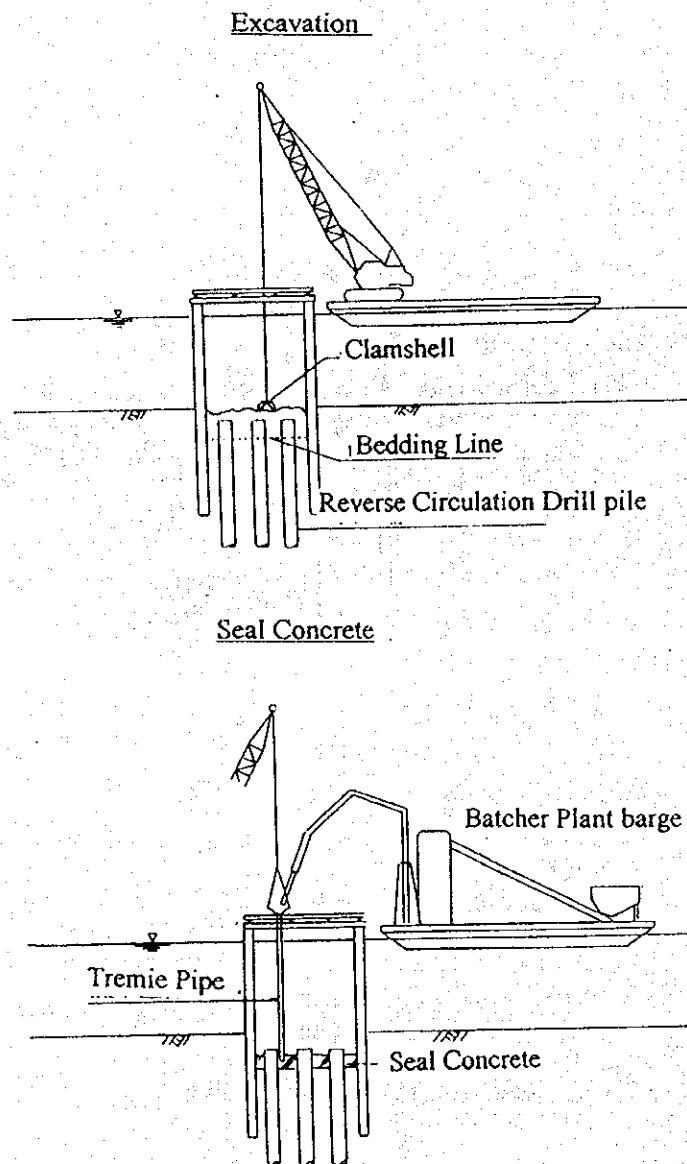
Excavation in Cofferdam and Placing Seal Concrete Underwater
